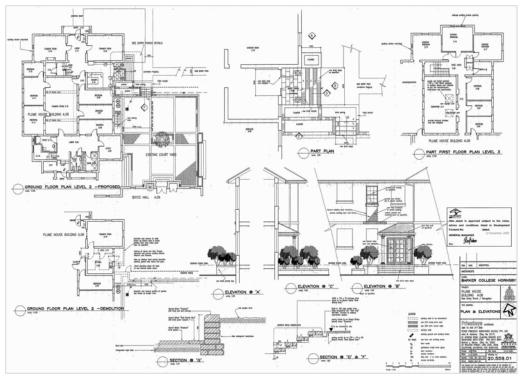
Approved and stamped plans, section and elevations for alterations to Plume House, prepared by Priestley's architects, dated 21 July 2006. (Source: Hornsby Shire Council, Online DA Tracker, DA/1826/2006, 91 Pacific Highway, Hornsby)
